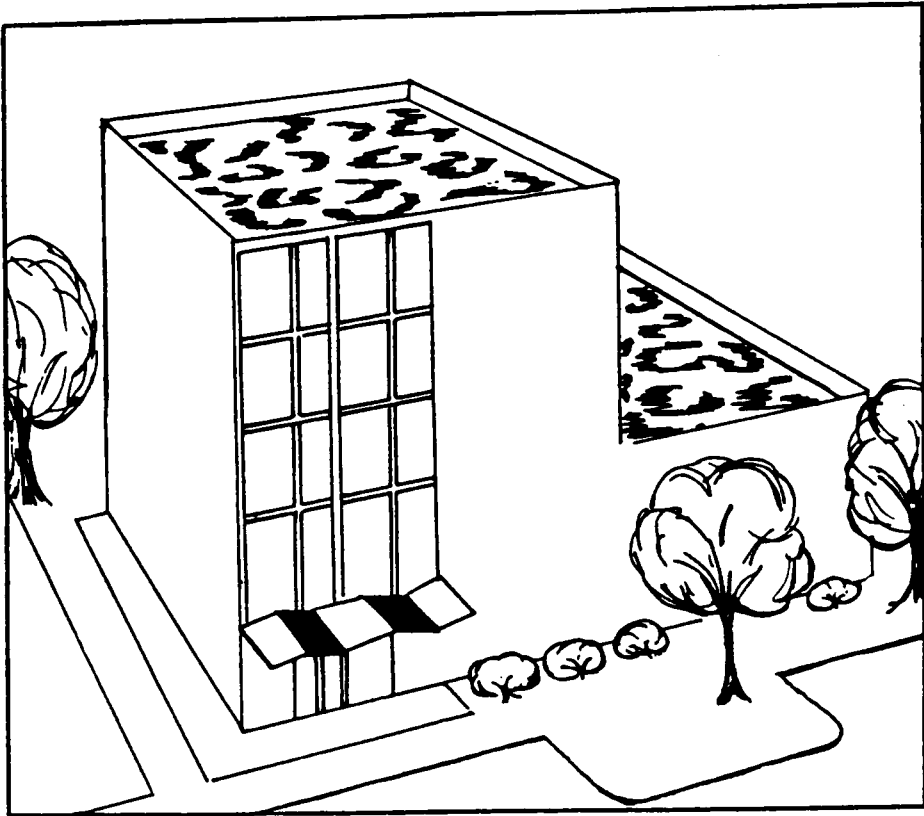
STORMWATER DETENTION ON A BUILDING
